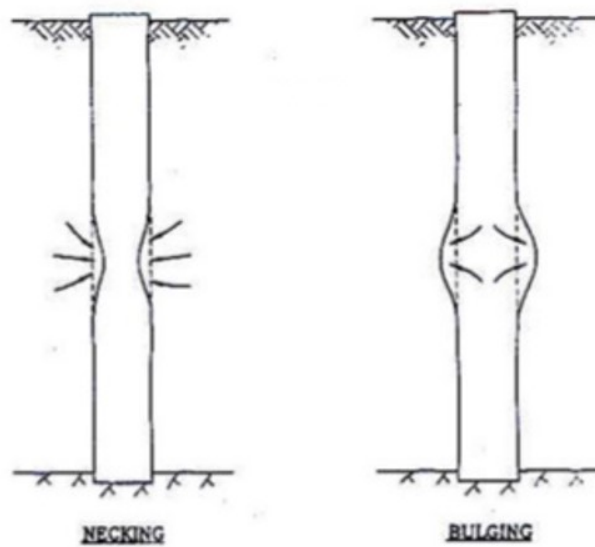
Illustration of necking (left) and bulging (right) in foundation piles (Modified from [Chua, 2011])
